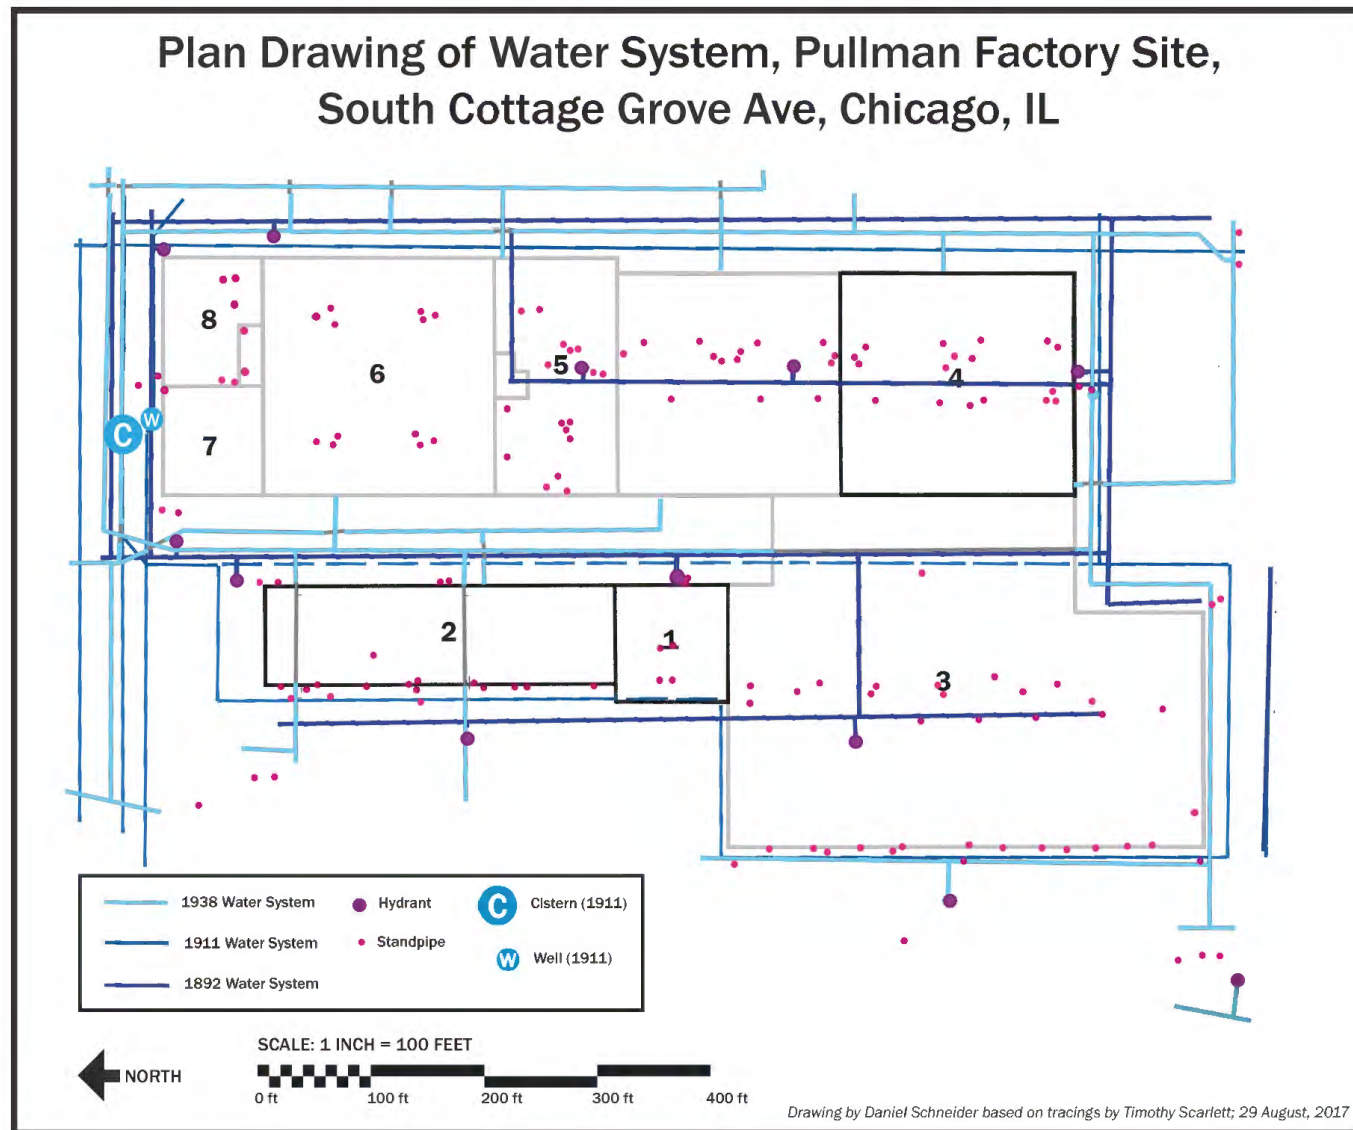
Plan of water system with hydrants, standpipes, wells, and cisterns, 1880-1955.
